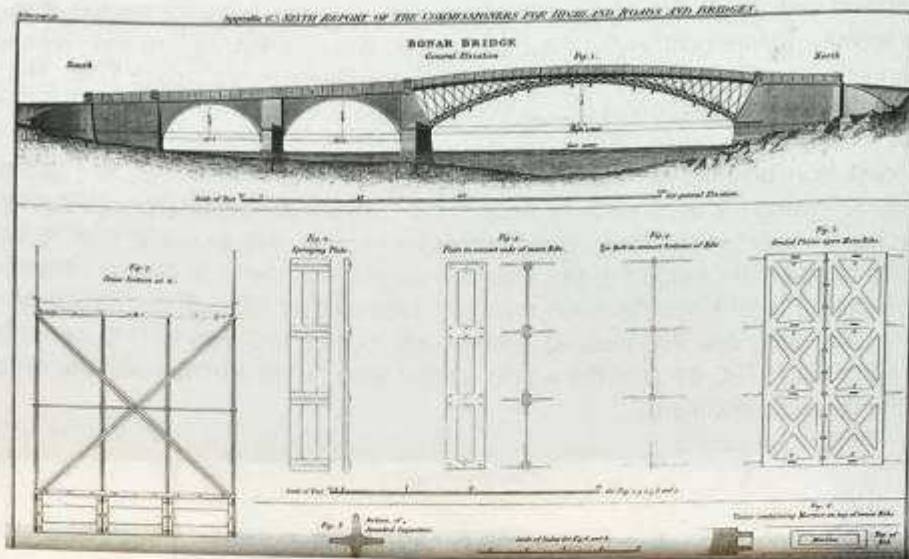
Bonar Bridge (1812-92). [6<sup>th</sup> Rep. Highland Roads & Bridges, House of Commons, 1813]
